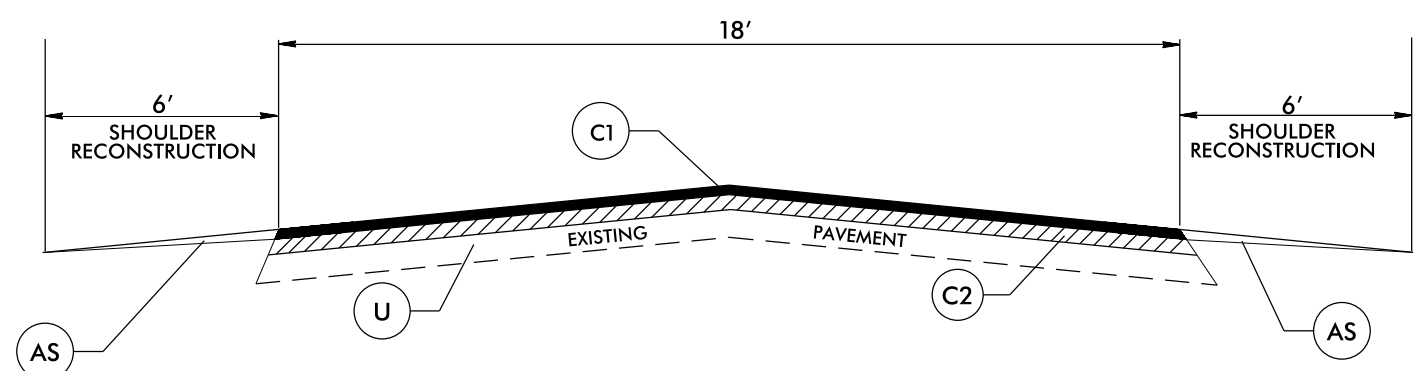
DETAILS OF PATCHING EXISTING PAVEMENT PRIOR TO RESURFACING
